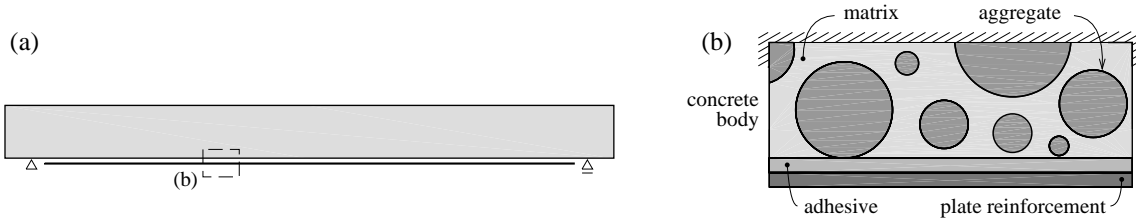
Unloaded concrete structure with plate reinforcement: (a) overview; (b) detail.
